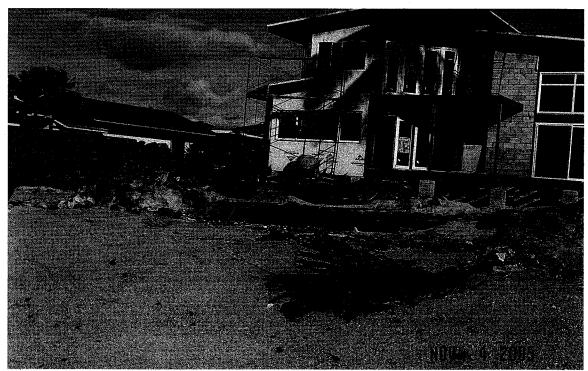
Newly constructed Single Family Residence and wall on the Waianae side of the property.
